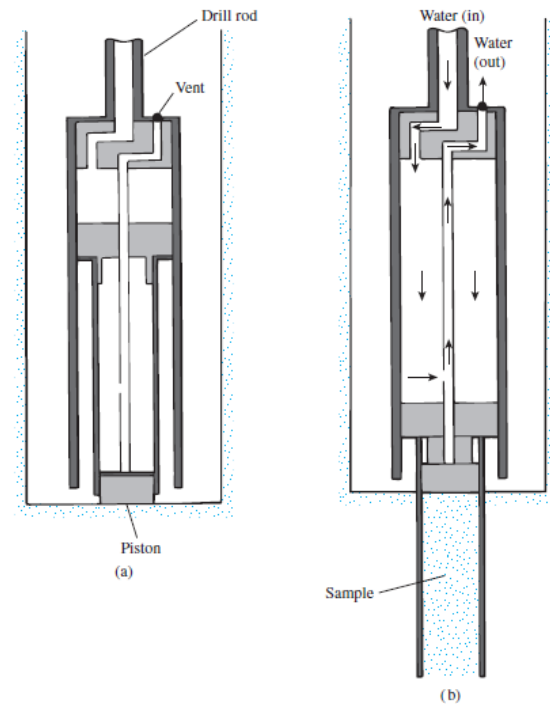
Piston sampler: (a) sampler at the bottom of borehole; (b) tube pushed into the soil hydraulically
